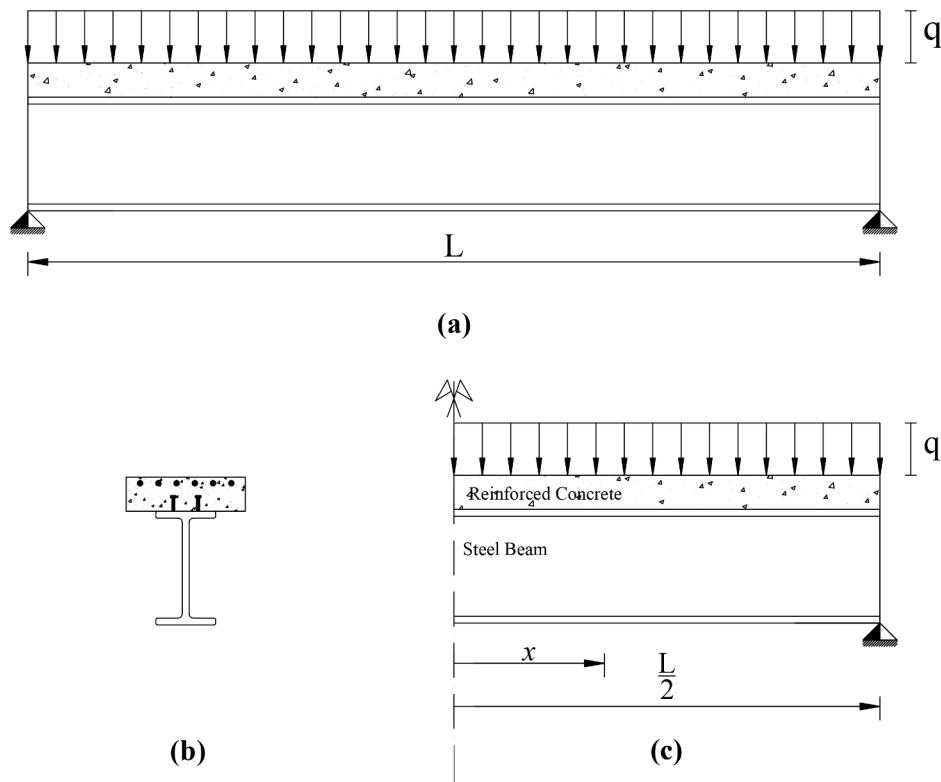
Typical steel–concrete composite beam: (a) frontal view; (b) section; (c) reference system.
